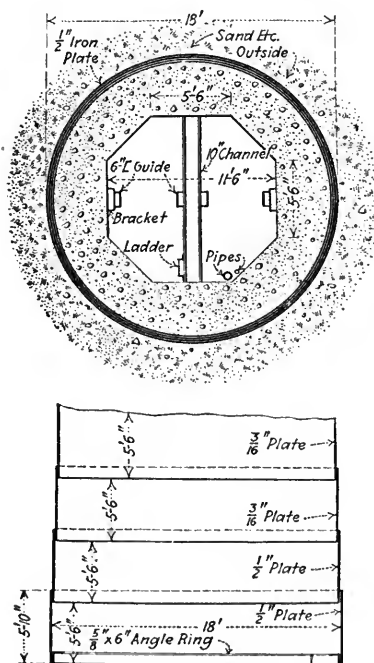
CONCRETE DROP SHAFT, PLAN AND SECTION.
